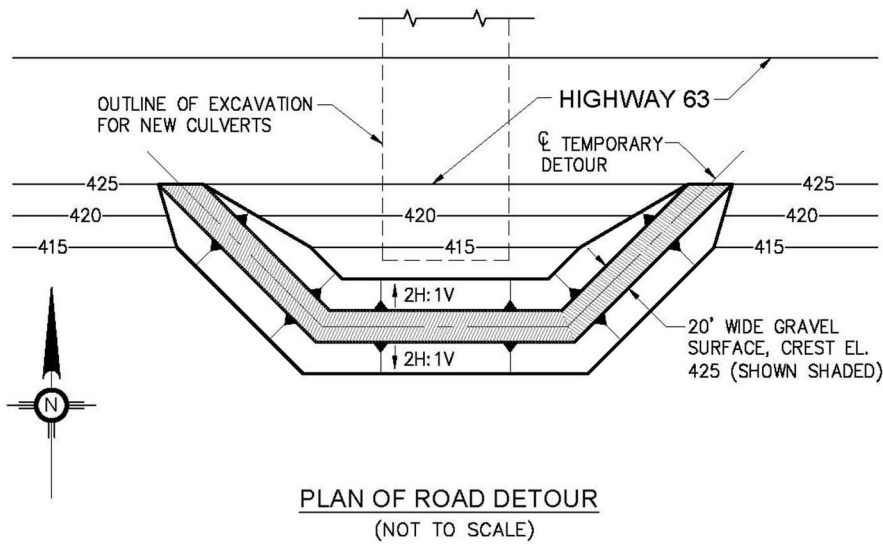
S-3. Plan of Road Detour Showing Slope Lines and Inclinations
